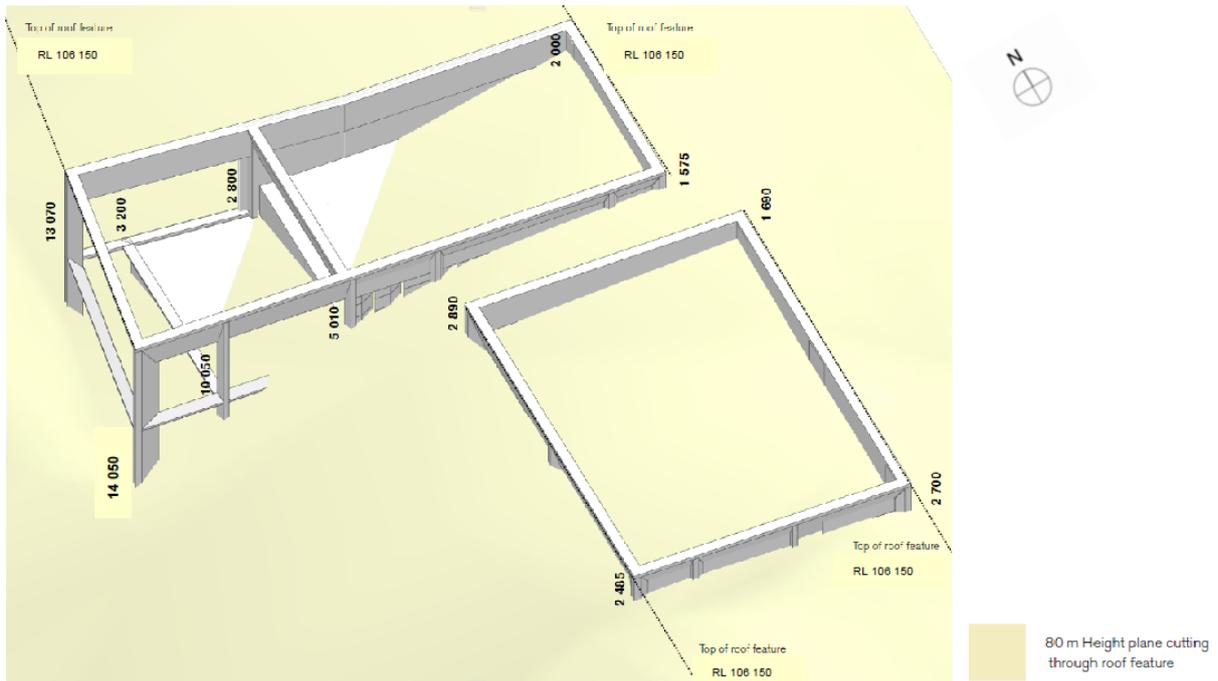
Axonometric view extract illustrating architectural roof feature elements exceeding the maximum 80 metre height plane
